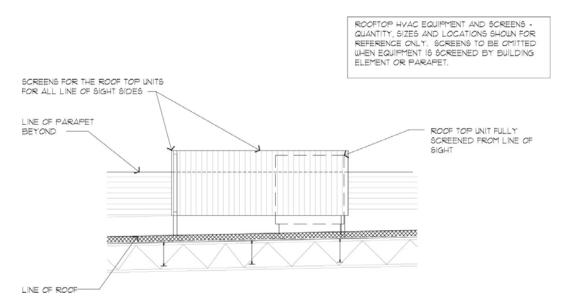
Typical Rooftop Parapet Acoustical Design (Smith Consulting Architects 1/15)
